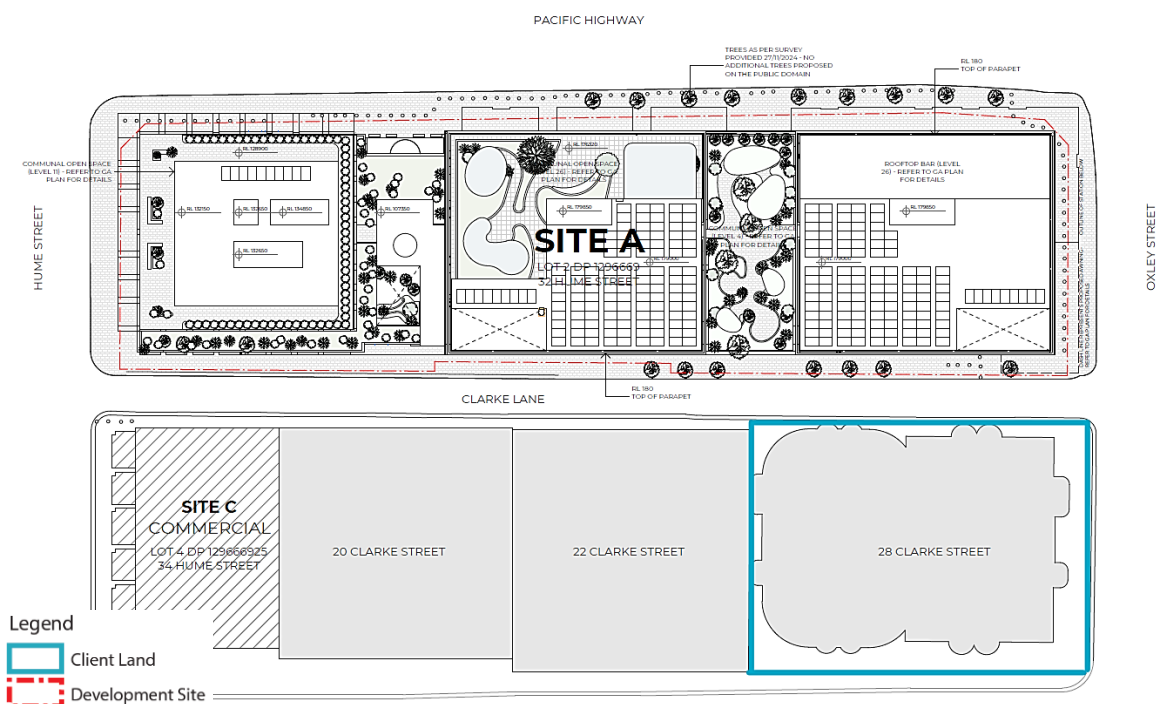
Extract of proposed site plan showing the Development Site relative to our Client's Land.
